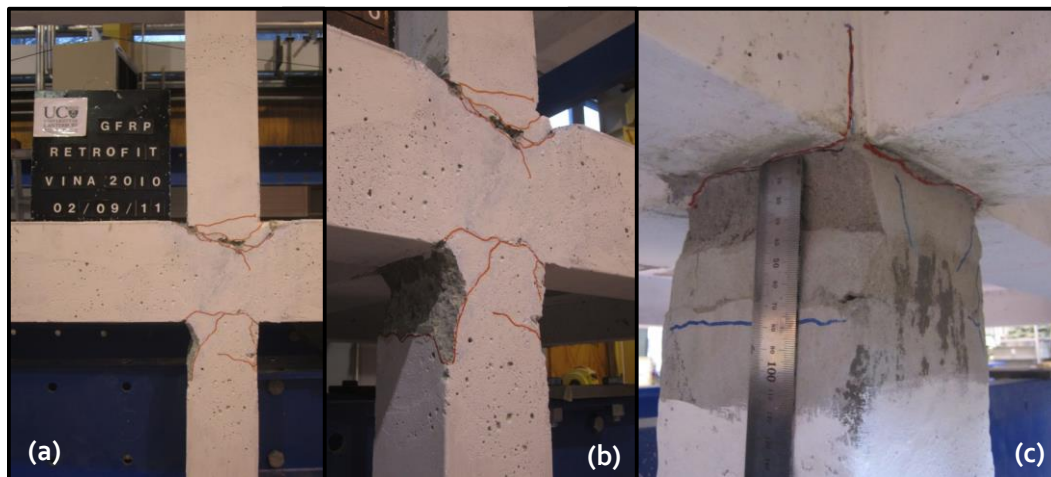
Observed damage in columns 1st floor interior beam column joints (a) external frame front view (b) 3D close up of (a), (c) external frame.
